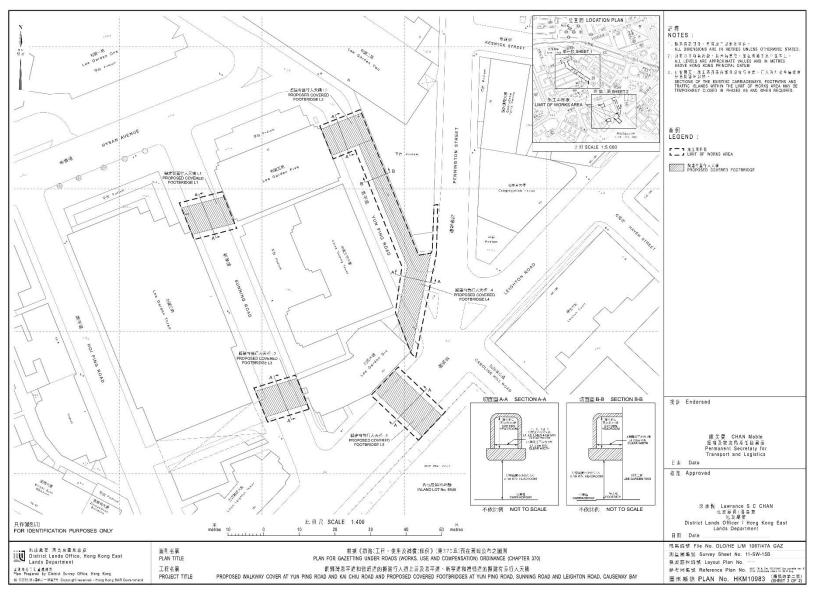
Plan showing the location of the 5 link bridges at Yun Ping Road, Sunning Road and Leighton Road, Causeway Bay.
